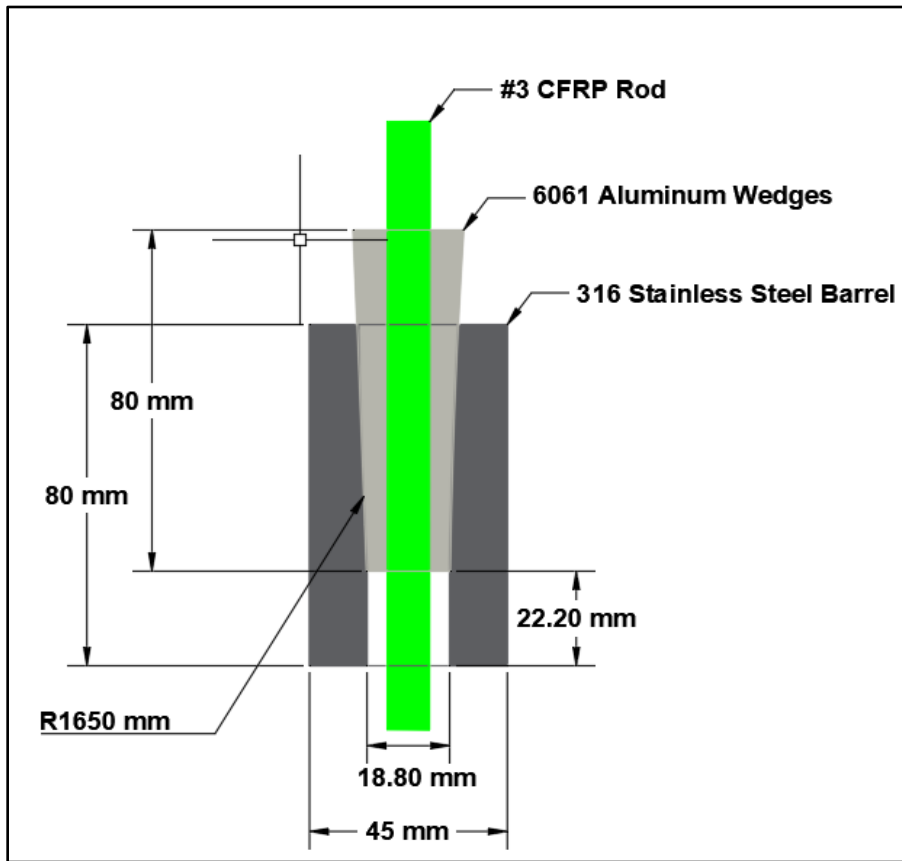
Split Wedge and Barrel Anchor Geometric Details
